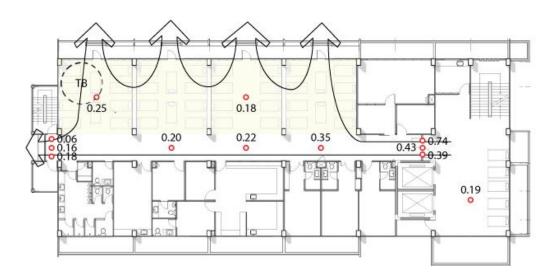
Floor plan and ventilation data of hospital B inpatient ward
